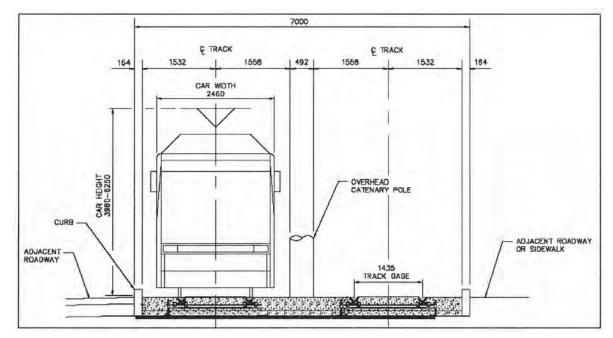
Typical Streetcar Cross-Section Dimensions from 2005 IBI Streetcar Study
